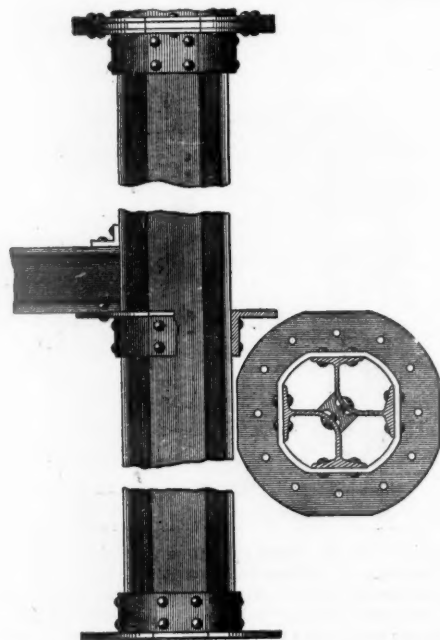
'Larimer' Column Construction as Used on Newberry Library, Chicago.
